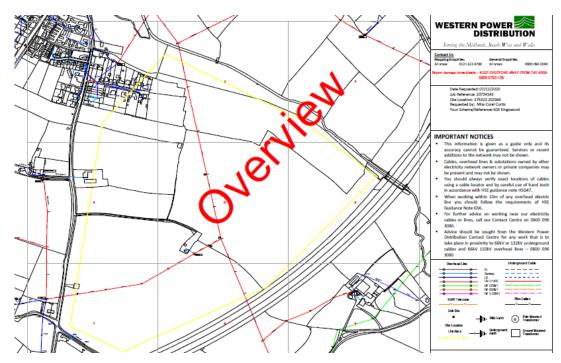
Extract of WPD showing overhead lines / underground cables owned by WPD (red line)
